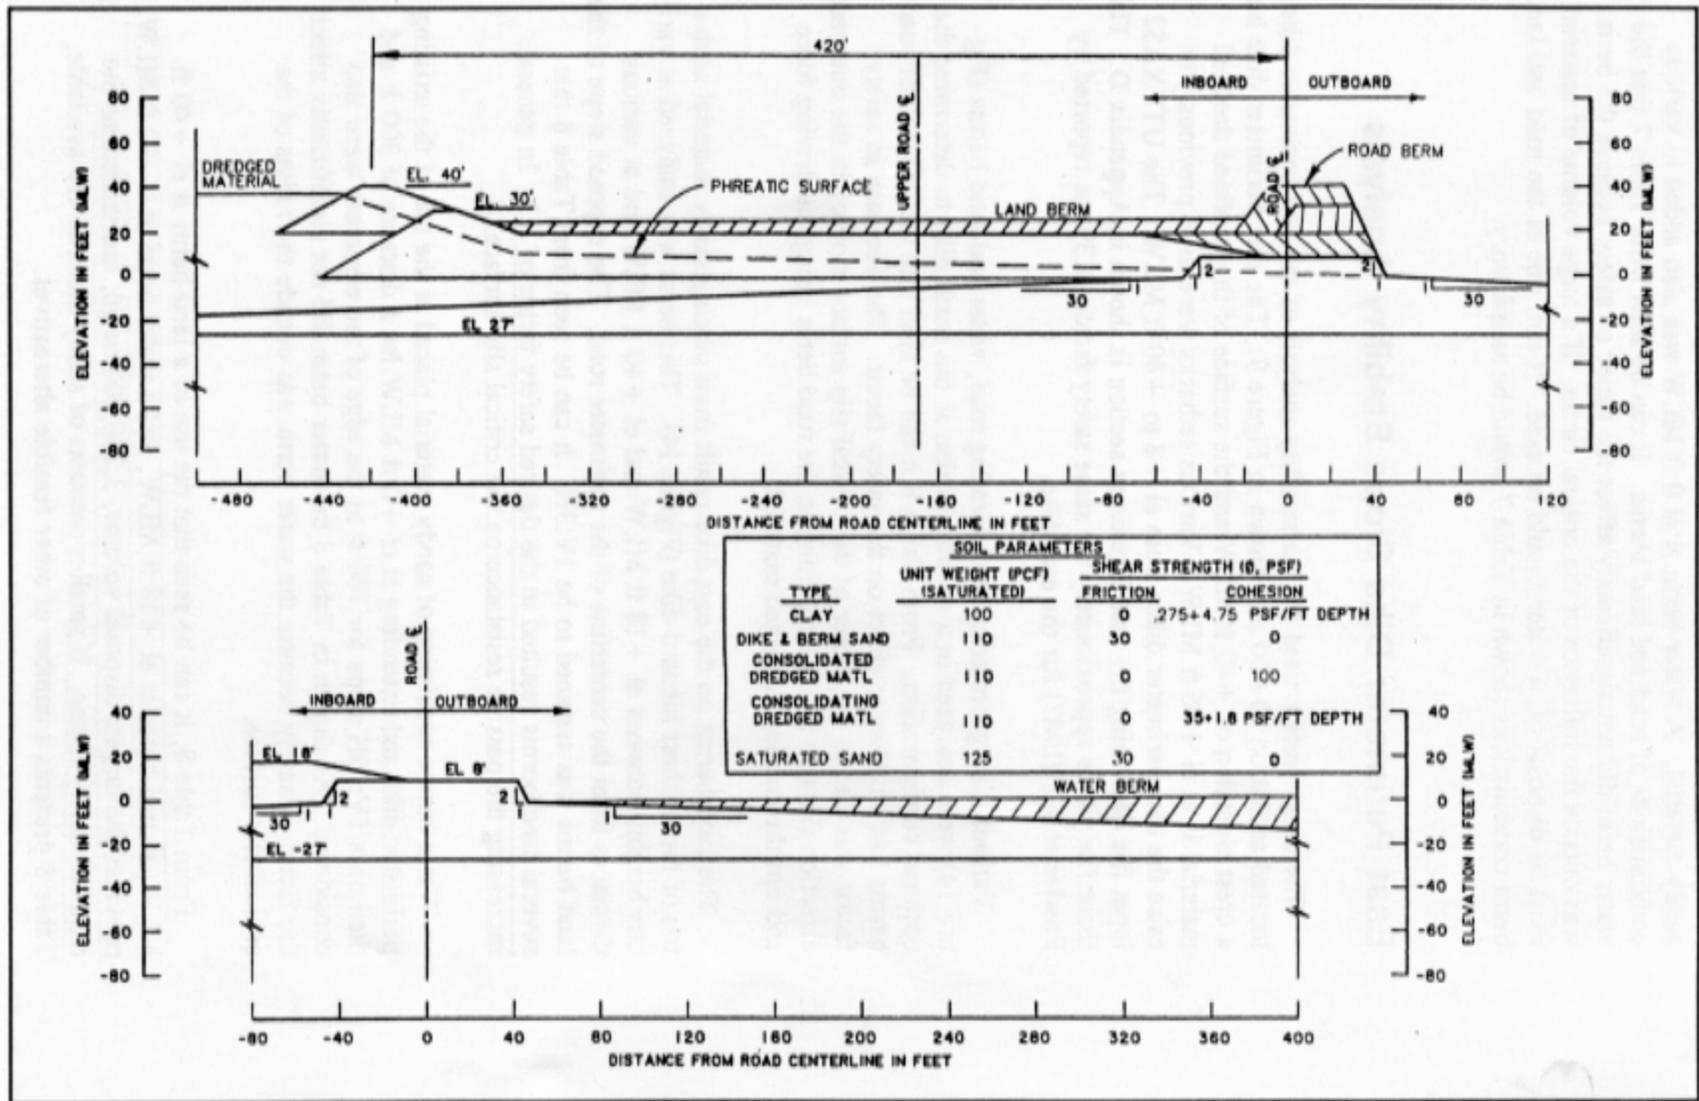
North perimeter dike cross-section showing relation between road and land berms
